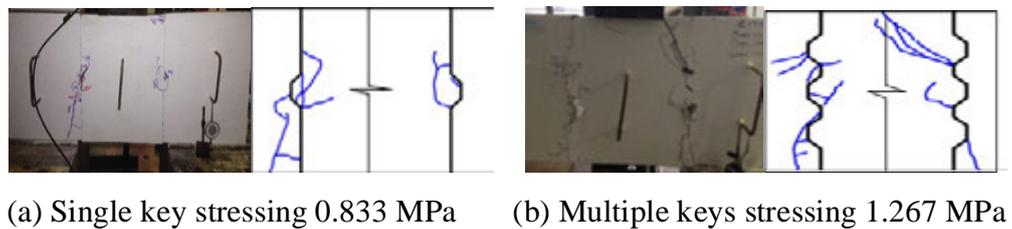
Actual and hand sketch of failure crack of trapezoid shape
